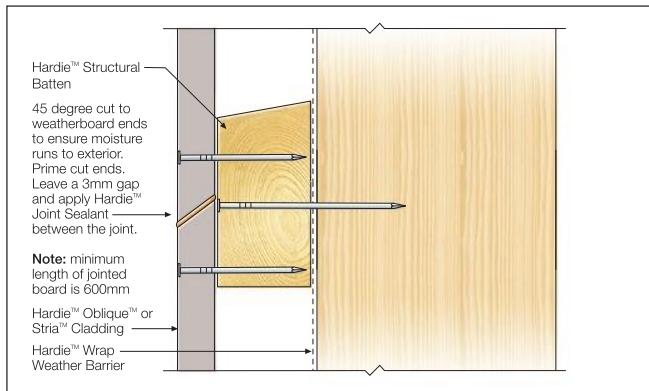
VERTICAL BUTT JOINT DETAIL
